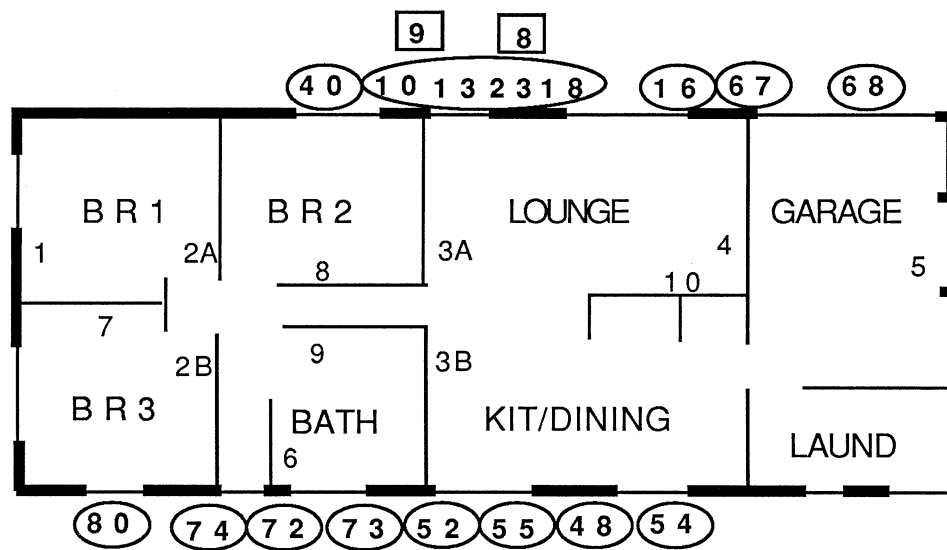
Location of Bracing Walls and Important Displacement Transducers for Exploratory Wall Racking Tests
